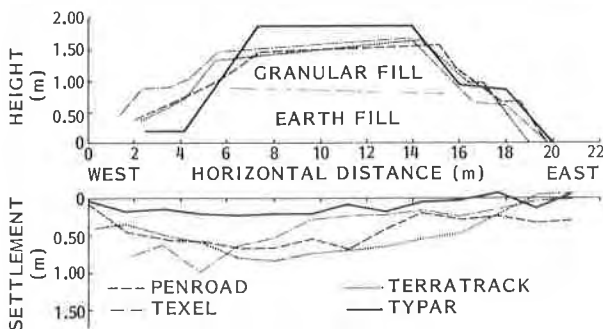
Manchester Embankment Cross Sections, showing fill height and settlements
